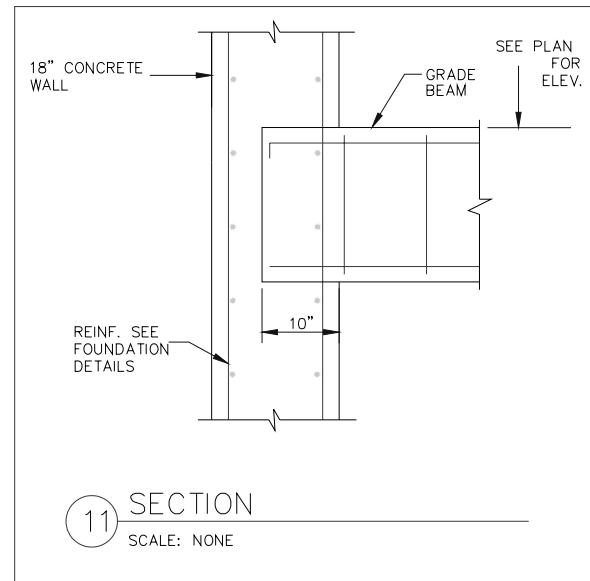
CAISSON & GRADE BEAM W/ OUTER DRUM WALL (EMC)
